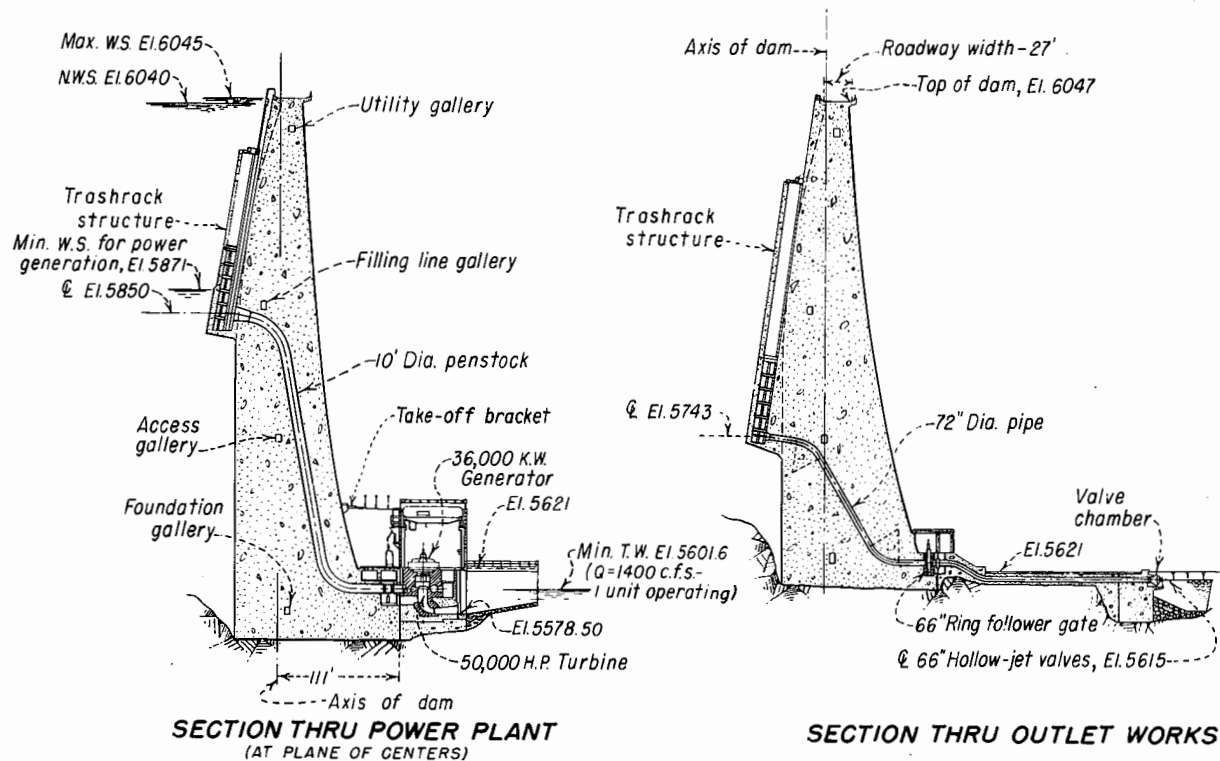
Penstock and outlet works structures—Flaming Gorge Dam.
